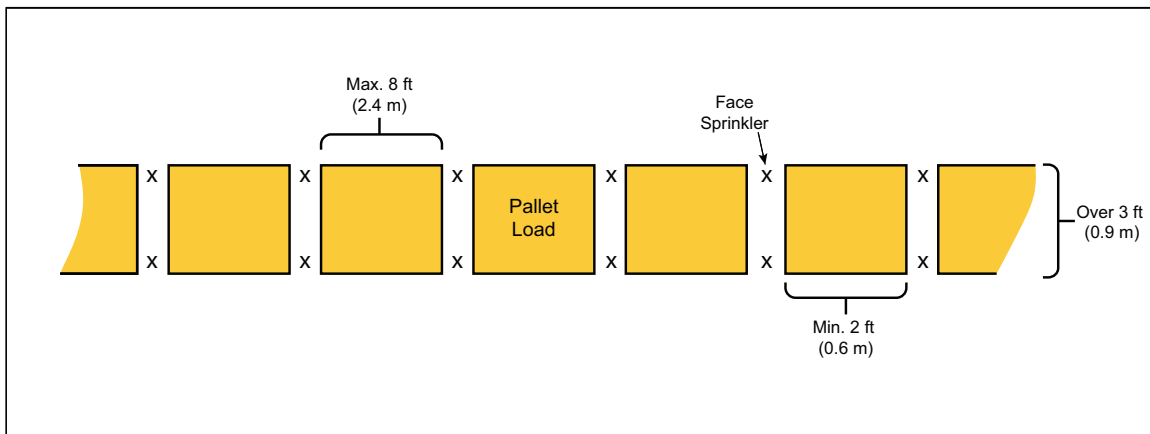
Plan view of IRAS(E) horizontal in-rack sprinkler arrangement for single-row racks over 3 ft (0.9 m) wide
